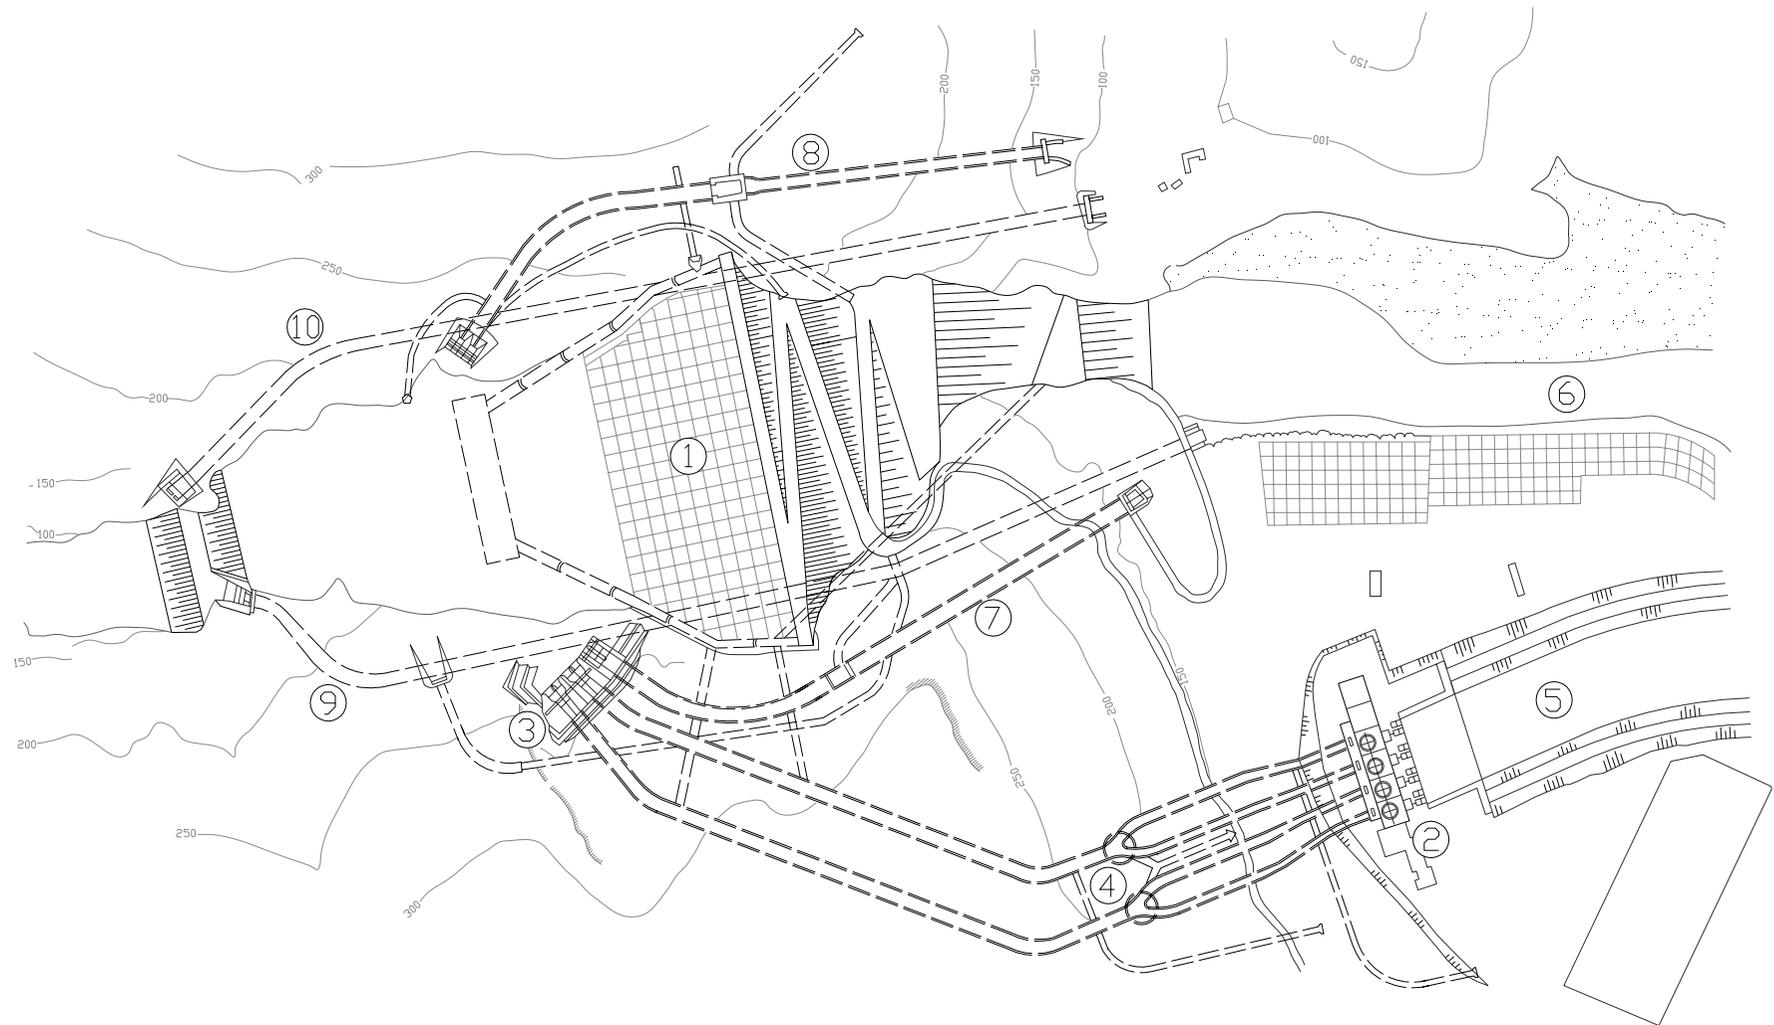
Layout of Koman HPP. ①: Concrete faced rockfill dam, ②: power house, ③: power waterway intake, ④: surge chambers, ⑤: tailwater channel, ⑥: Drin River, ⑦: tunnel spillway No. 4, ⑧: tunnel spillway No. 3, ⑨: diversion tunnel No. 2, ⑩: diversion tunnel No. 1.
